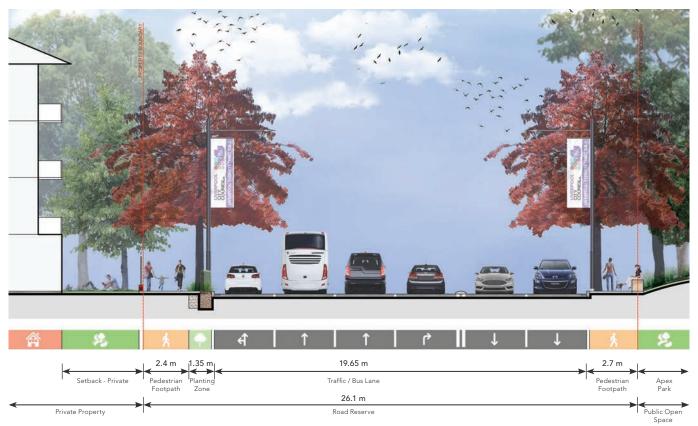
Elizabeth Street (West) - Section BB - Proposed (Liverpool City Council)
